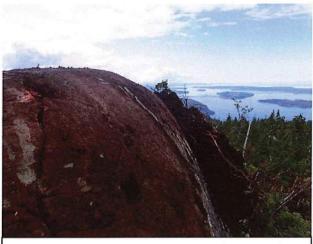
Provided photo of steep bedrock slope on northern side of site currently covered with blast rock fill
